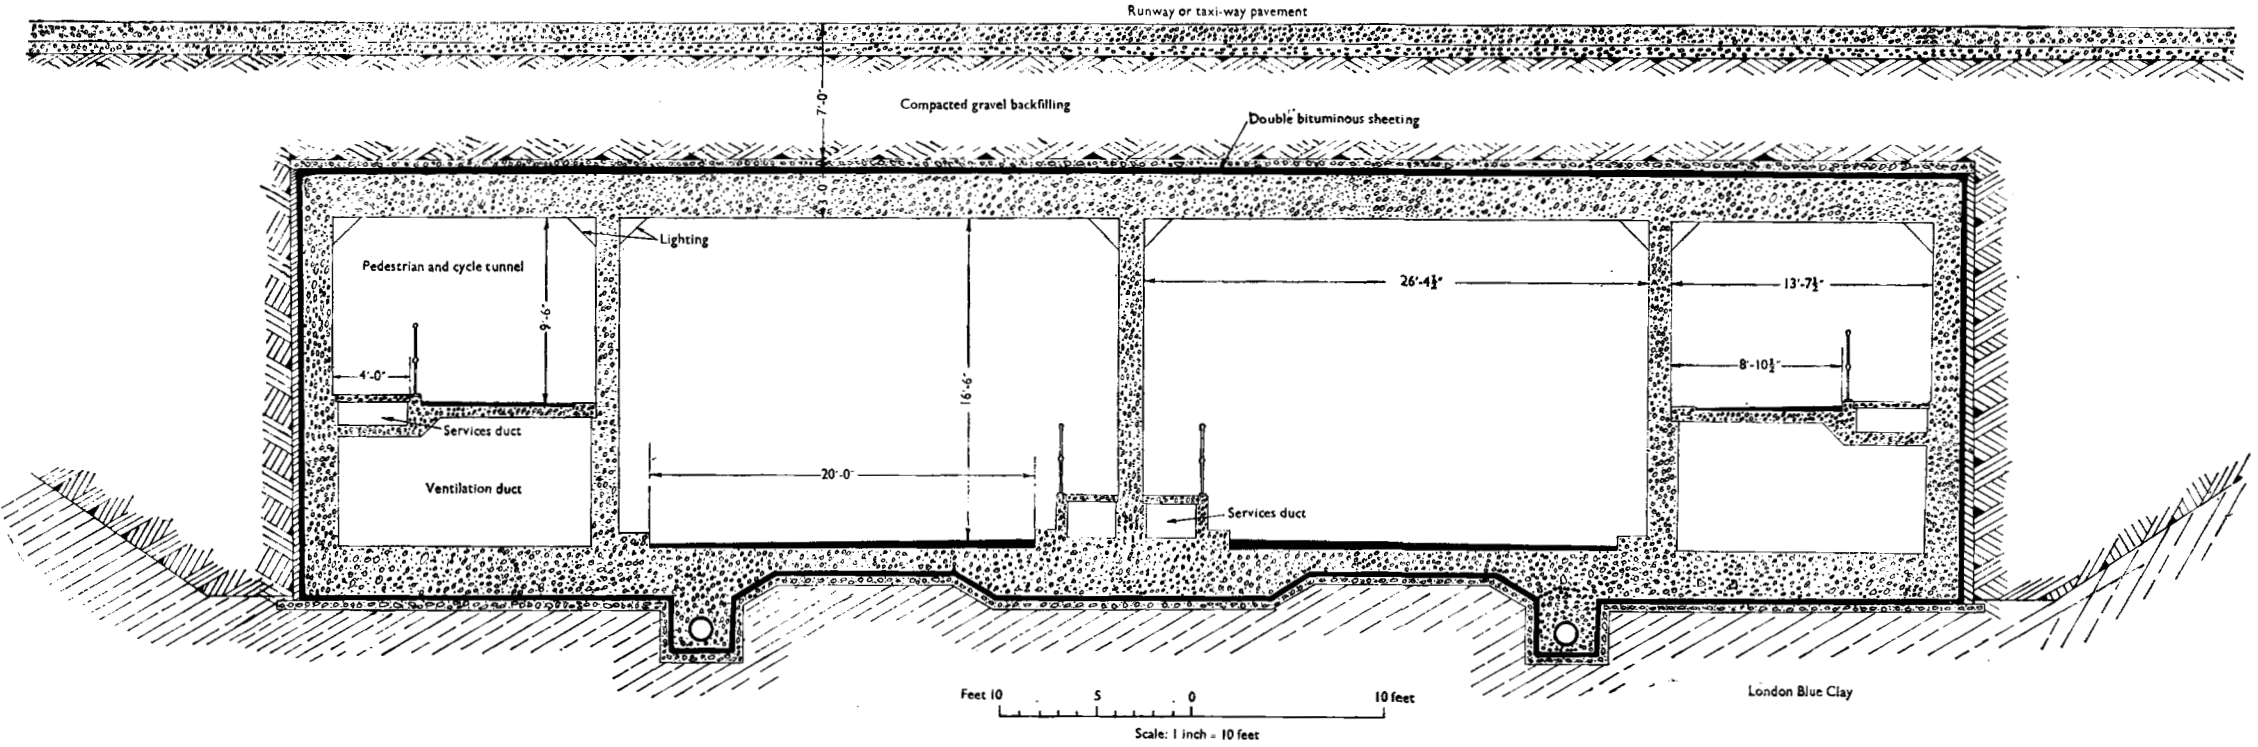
MAIN ACCESS TUNNELS. TYPICAL CROSS-SECTION
